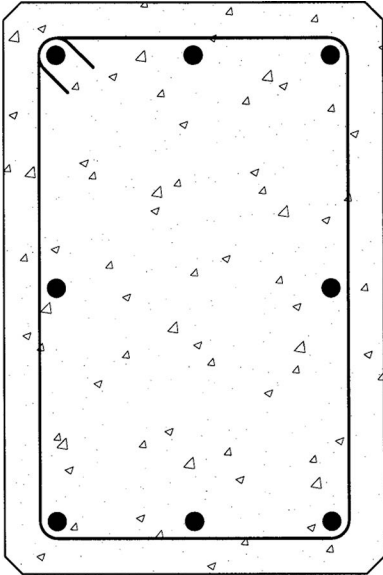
A typical closed stirrup used in a simple rectangular cross section.
